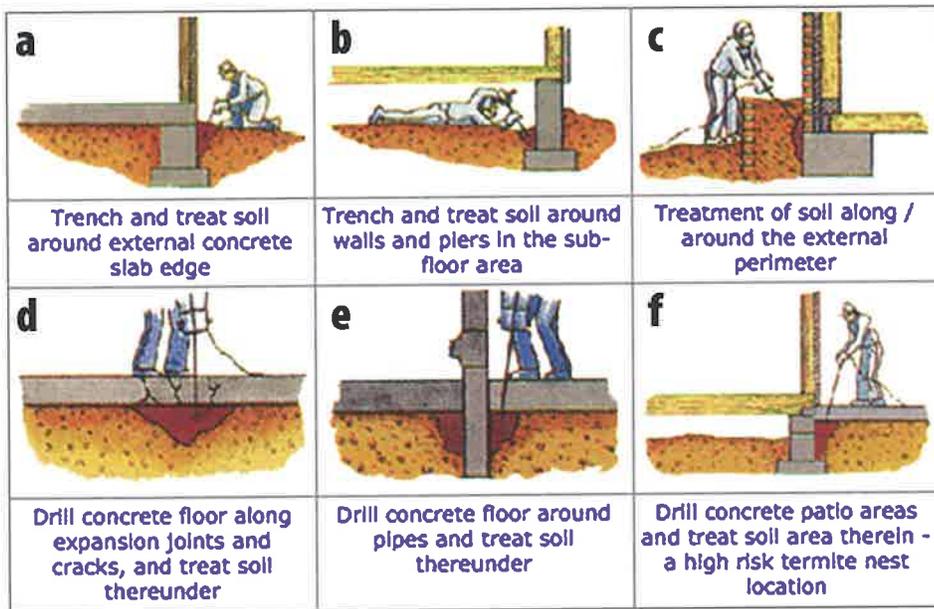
Termiticide application methods requiring trenching soil or drilling concrete slab followed by and vertical rodding: (a) exterior foundation; (b) crawl space interior foundation; (c) soil-filled planter at exterior foundation; (d) sub-slab injection at stress cracks; (e) pipes, drains and interior load-bearing walls penetrating slab floor; (f) slab (porch, driveway, sidewalk) abutting exterior foundation.
